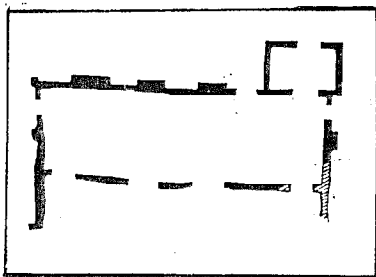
Plan of building at Tell el-'Oueili (after Forest 1983, p. 78).
